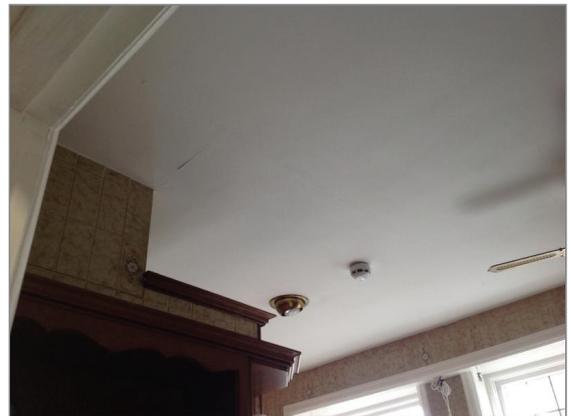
Hairline cracking to joints of plasterboard of kitchen ceiling
